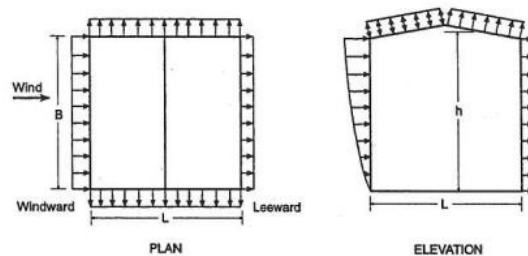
Wind Load That Occurs Happen in Single Building [2]
